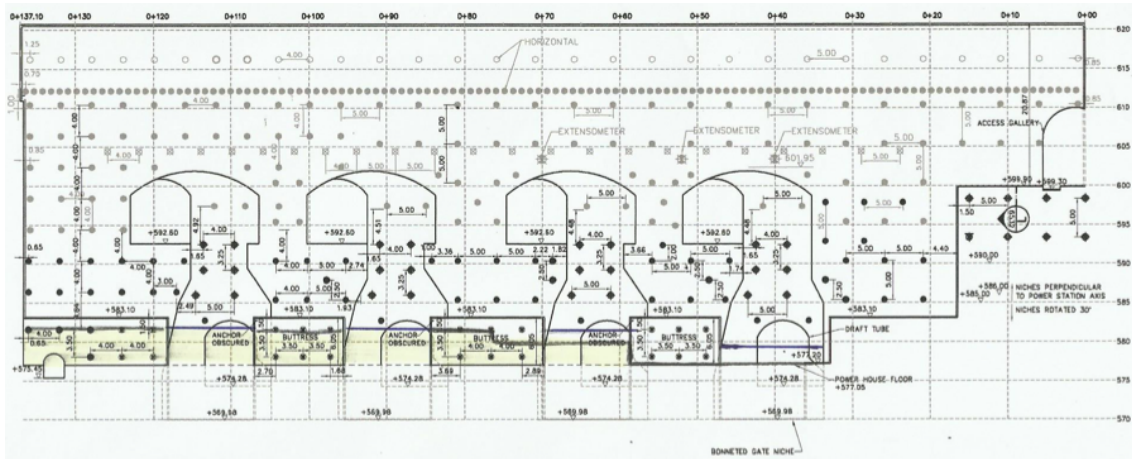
Downstream wall of powerhouse cavern (NJC, 2013b)
